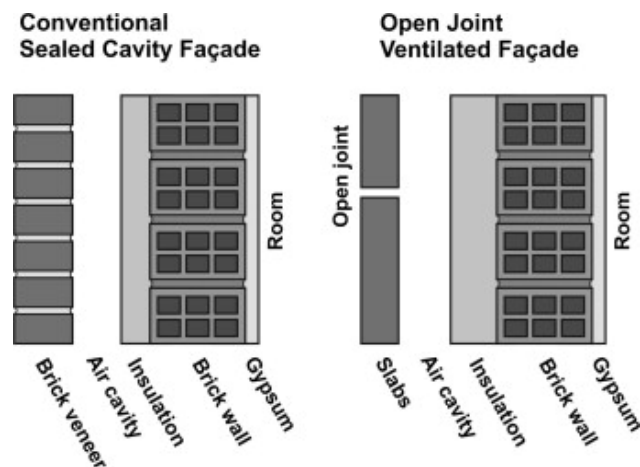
A typical cross section of a conventional cavity façade and an OJVF (Sanjuan et al., 2011b).
